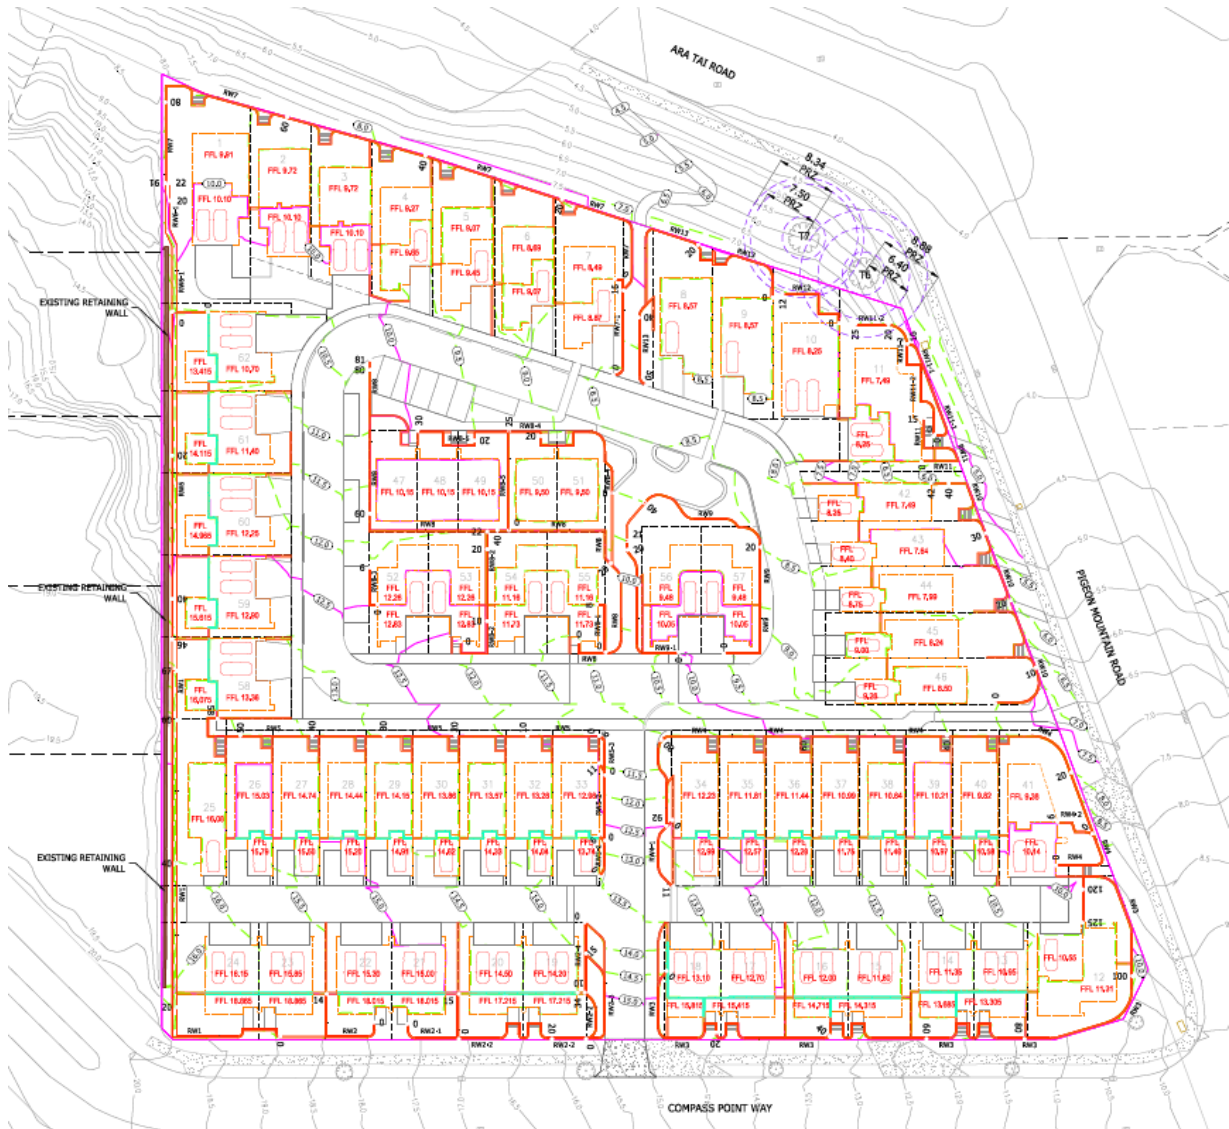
Retaining Wall layout (Source: Eighty6 Engineering)
